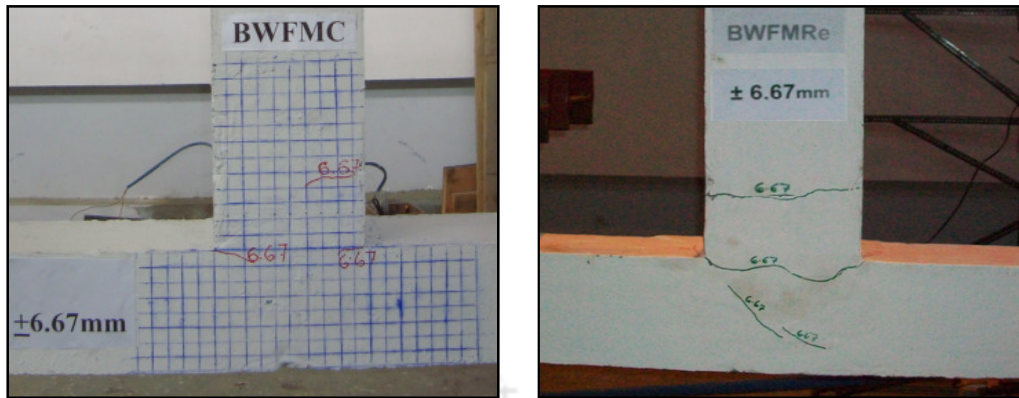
Appearance of first cracks for BWFMc and BWFMRe specimens under loading type-1
